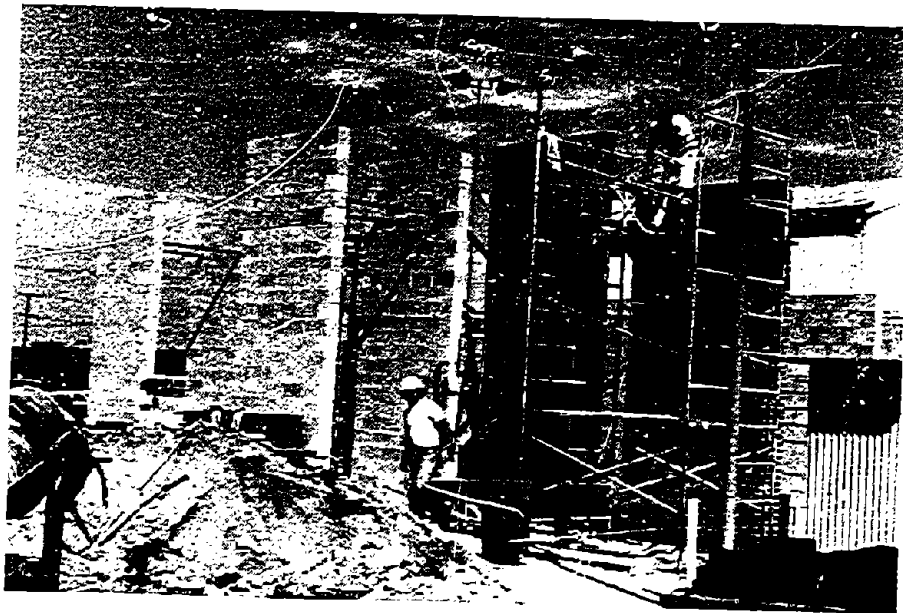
VIEW OF WALL TEST SPECIMENS IN CONSTRUCTION AREA
